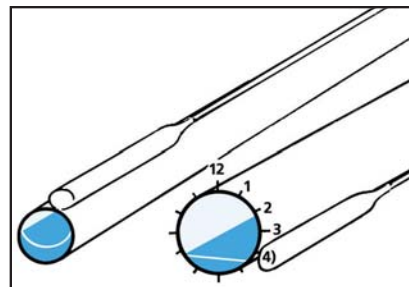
The bulb is best mounted on a horizontal suction line tube and in a position corresponding to between 1 o'clock and 4 o'clock.
